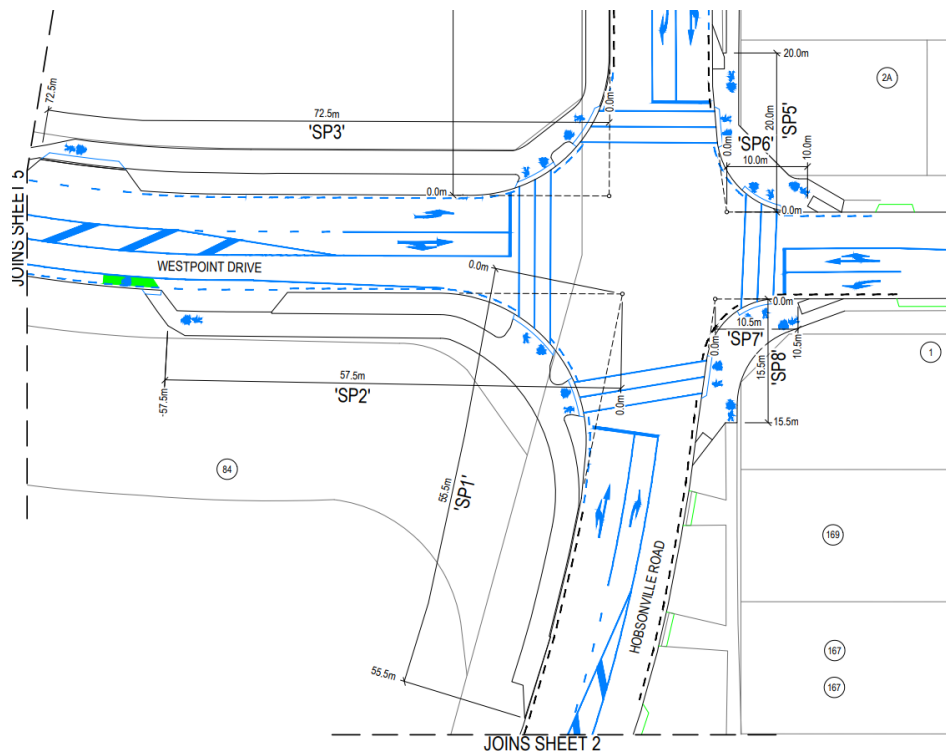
Auckland Transport approved plans for the recently constructed Westpoint Drive showing all works outside 84 Hobsonville Road
